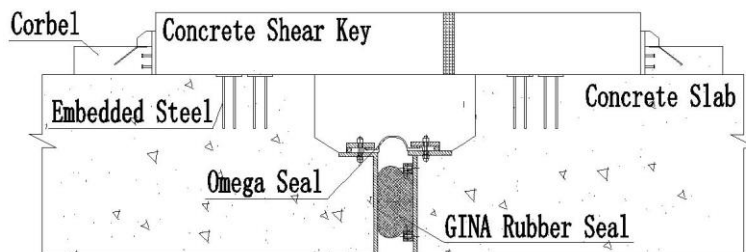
Detailed view of the prototype joint with concrete shear keys
